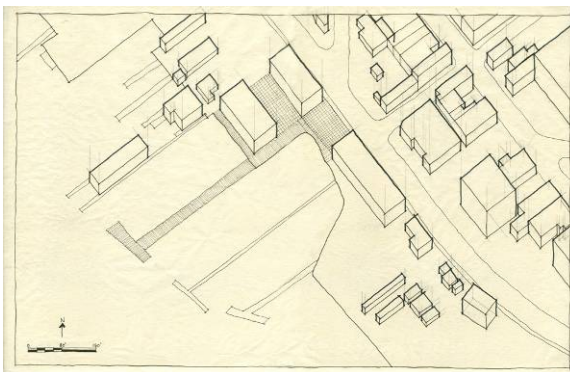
Site axon showing site in context with building heights of surrounding buildings.
